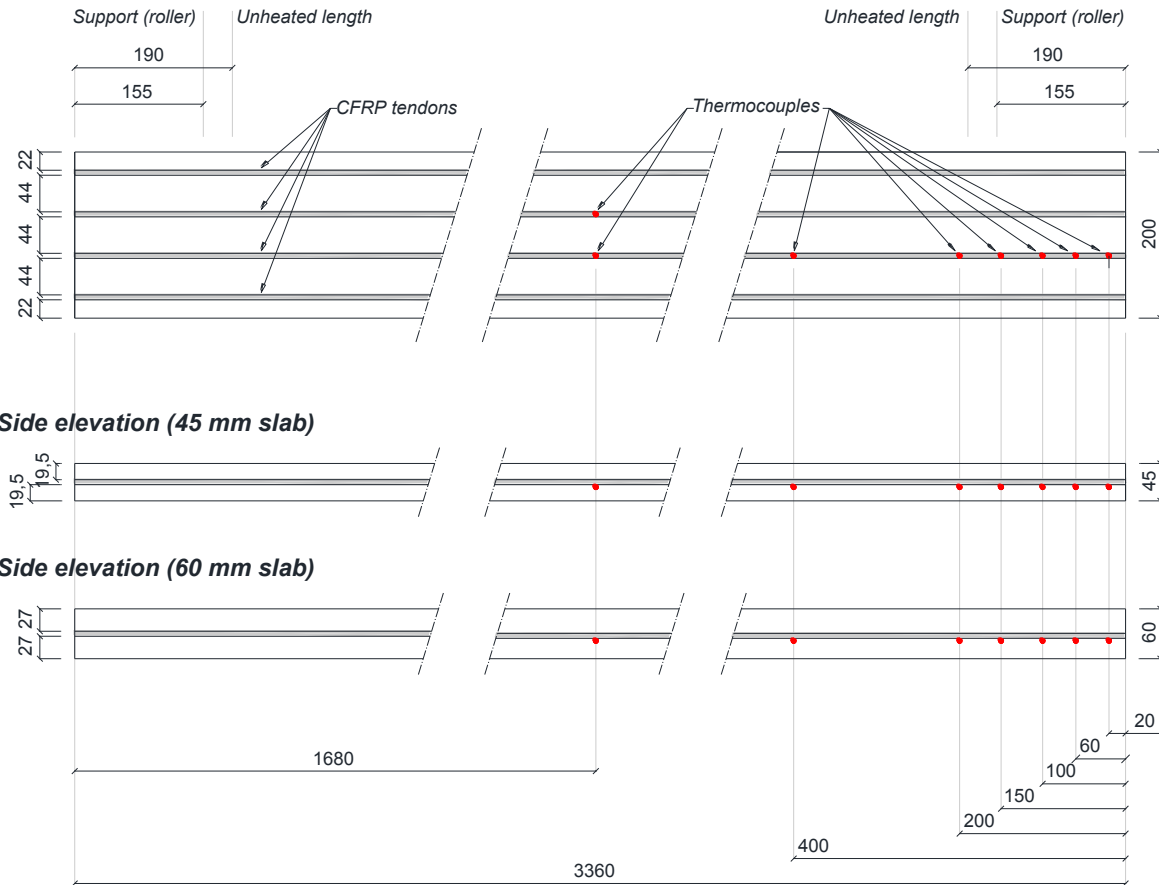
Plan view and side elevations for slabs 45 and 60 mm thick, also showing thermocouples position (CFRP grids in the anchorage zones are not shown).
